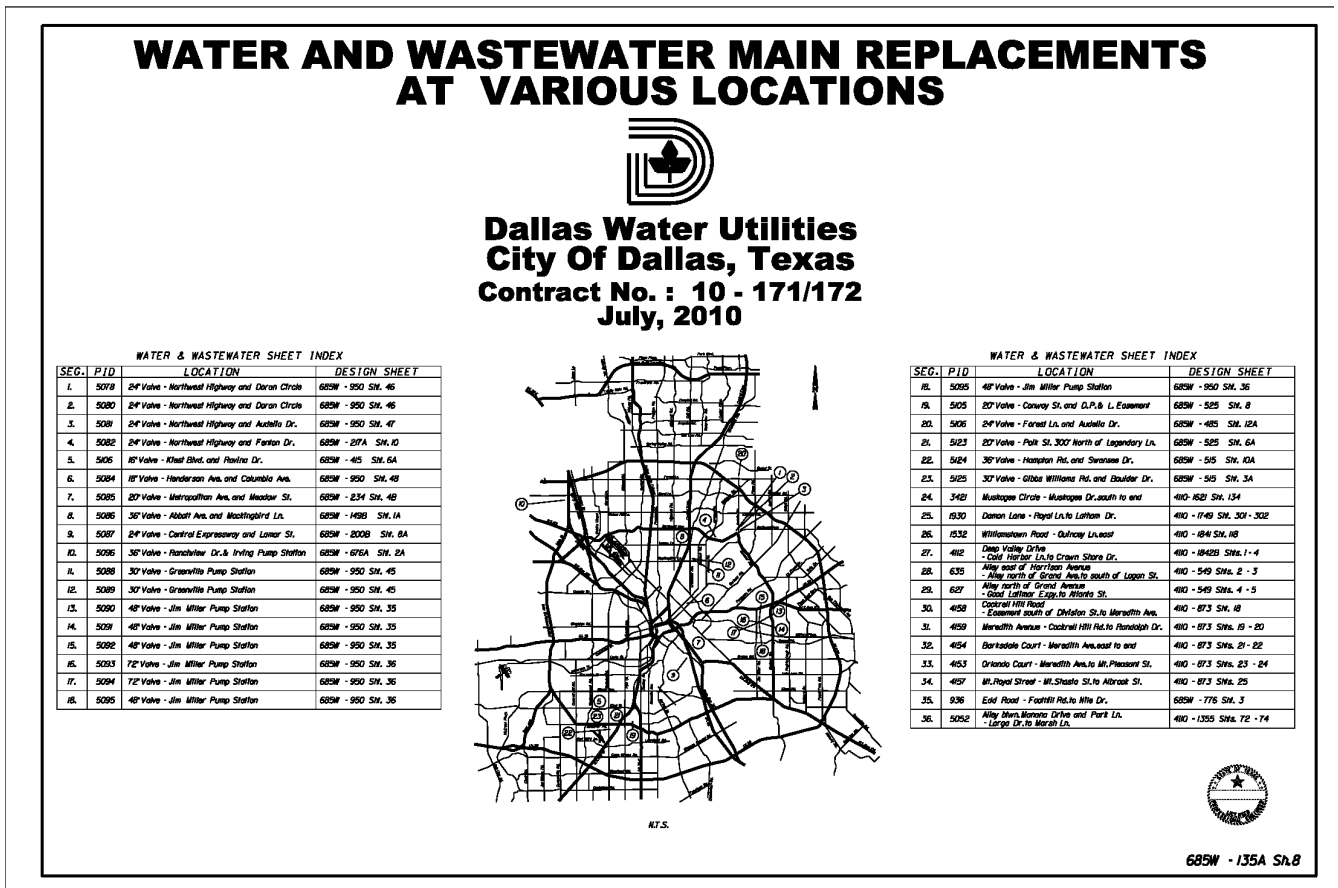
TYPICAL COVER SHEET FOR A MULTIPLE LOCATIONS PROJECT
